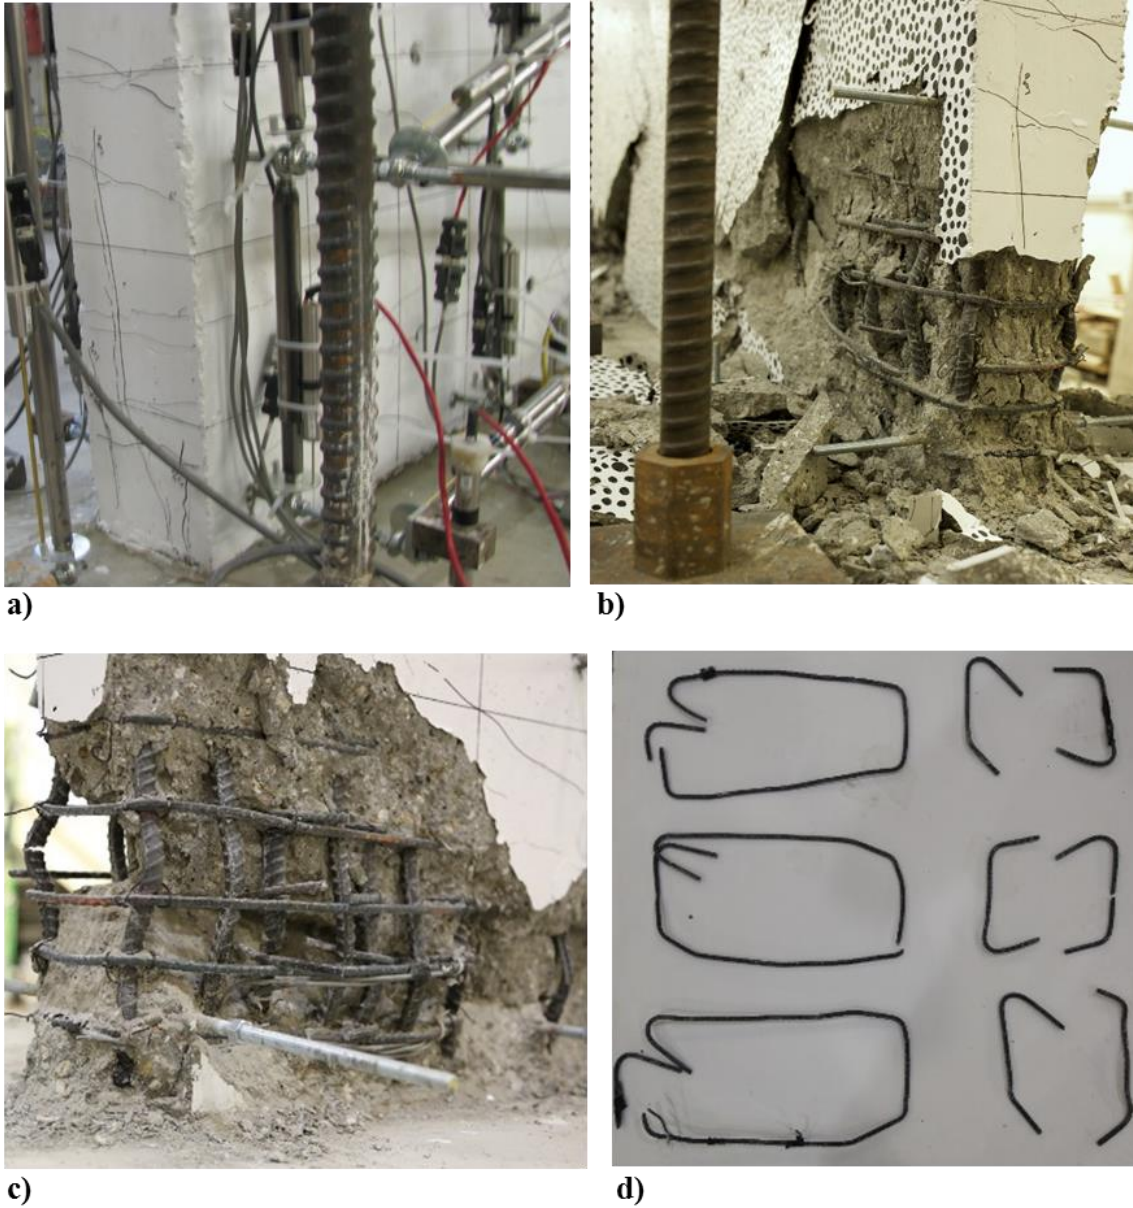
Specimen WP1 east boundary damage progression – a) Vertical splitting of concrete (-1.0% rotation, cycle 1); b) Crushed concrete and buckled longitudinal reinforcement immediately after failure (-1.97% rotation); c) After removal of loose concrete; and d) Damaged hoops and cross-ties removed after test
